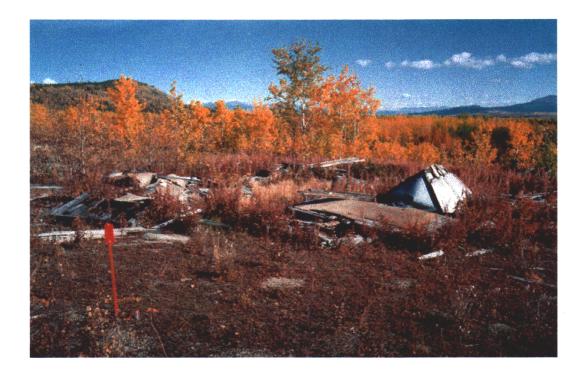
Stony Creek (East) - Concrete foundation and minor building debris.
